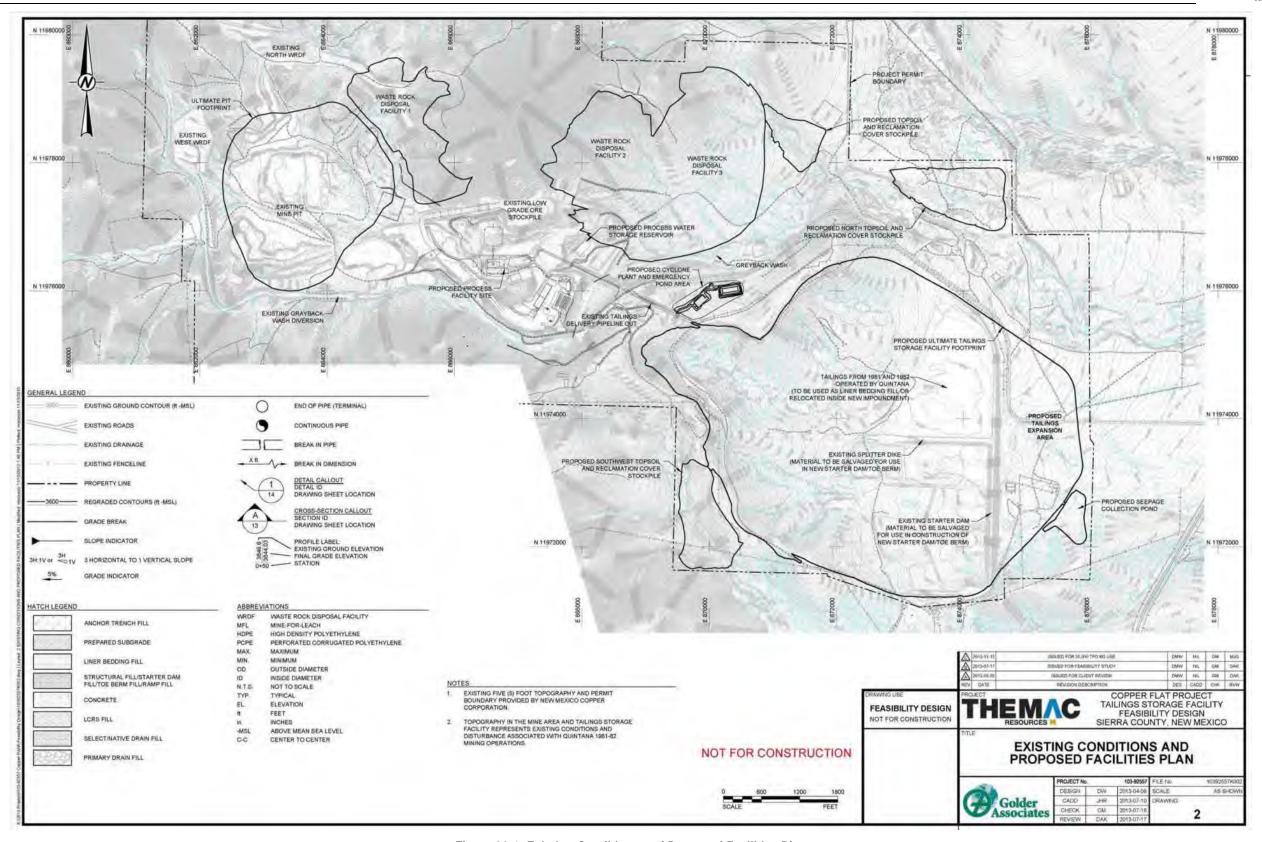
Existing Conditions and Proposed Facilities Plan
